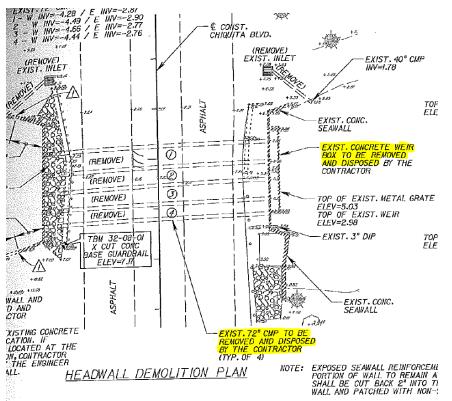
Chiquita Blvd Improvement plans indicate that the existing culverts and Weir 20 will be removed and disposed of and then replaced with structures of the same or similar dimensions and elevations.
